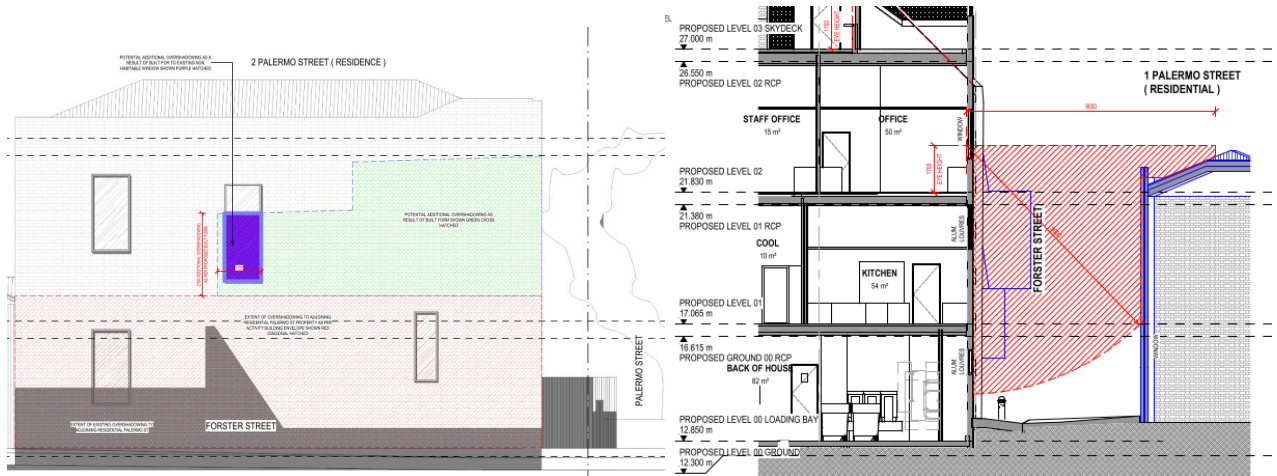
Adjoining residential dwelling showing existing shadow in red and additional shadow in green and purple (left)
